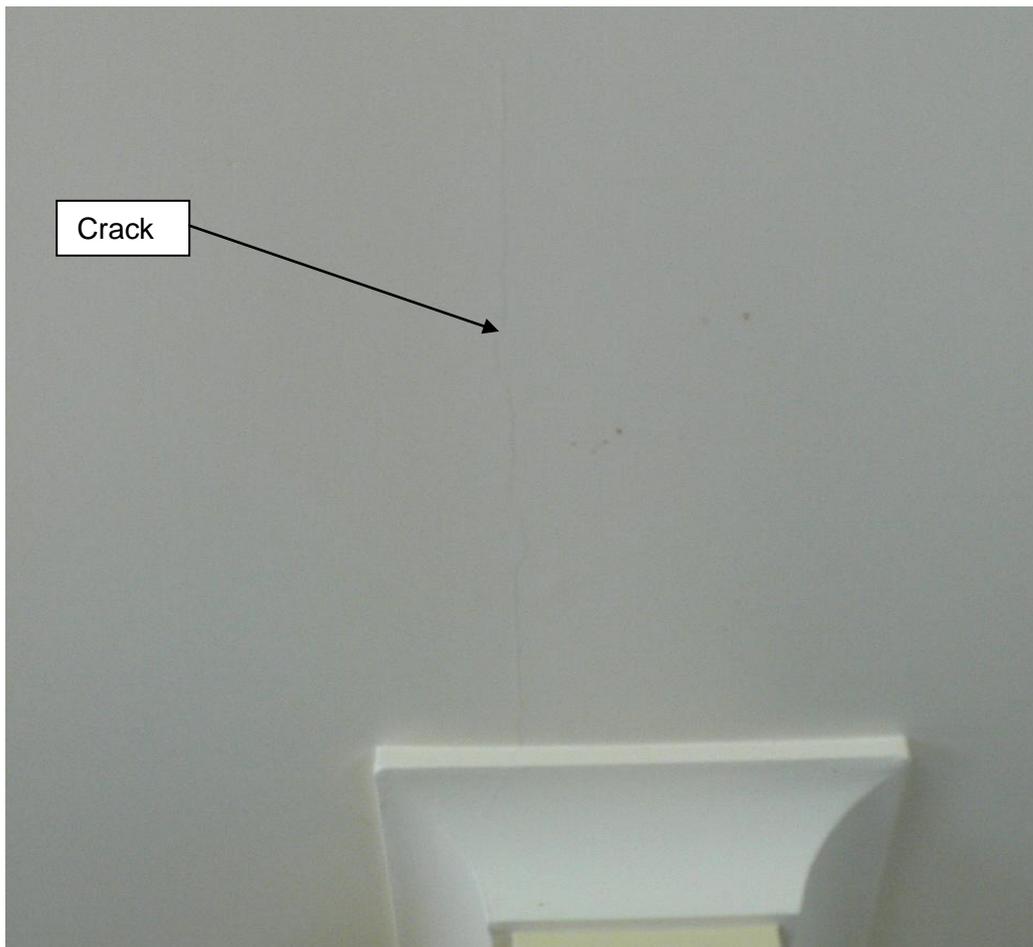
Fine ceiling crack extending across the ceiling from the end of an internal wall
